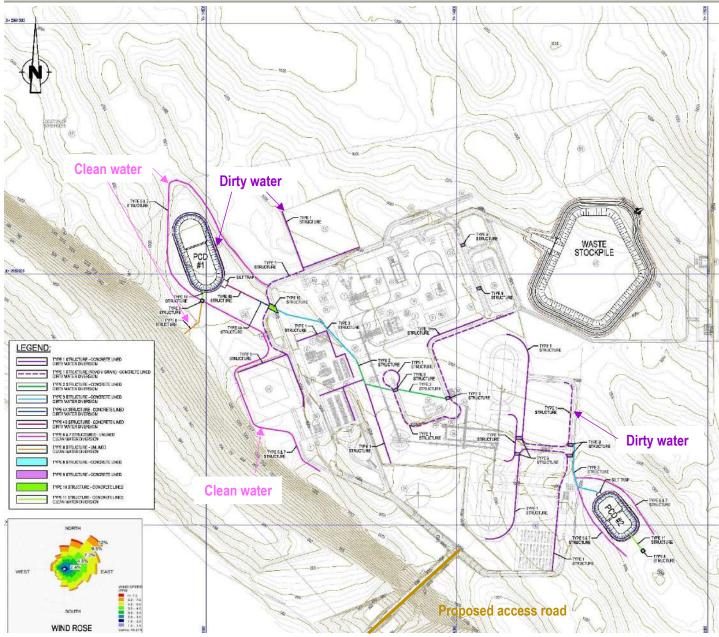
Proposed stormwater management layout associated with the surface infrastructure layout (WorleyParsons, 2019).
